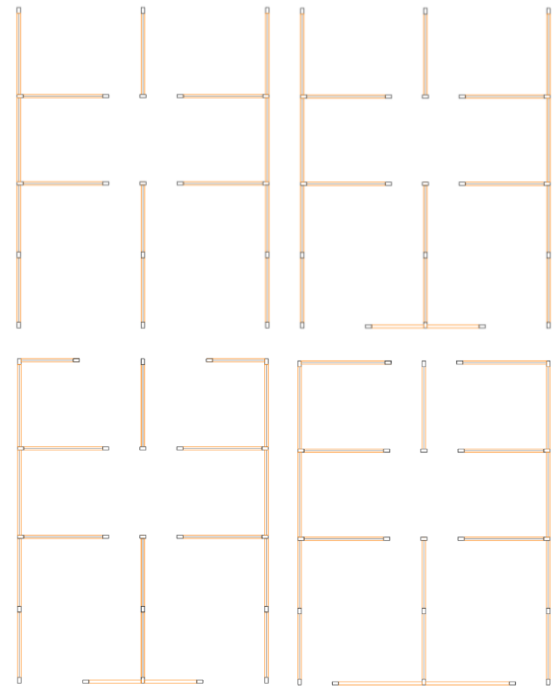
Typical floors of buildings with wall density of a) 1.4%, b) 1.9%, c) 2.4% and d) 2.9%
